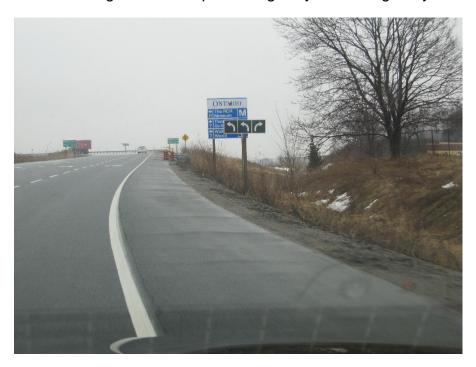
View looking along the exit ramp toward the impacted ET-PLUS guardrail terminal.
